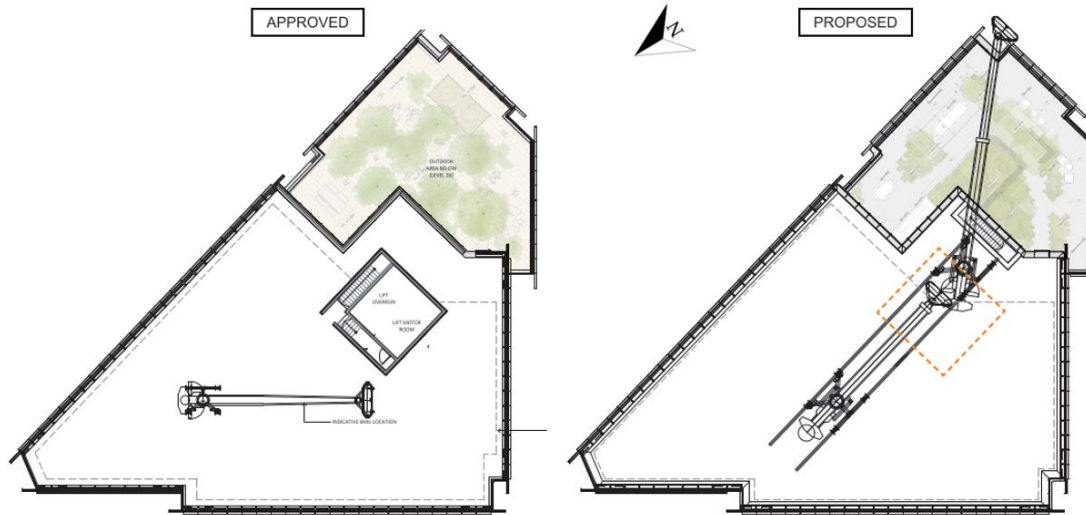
| Approved roofscape (left) and proposed (right) roofscape with removed lift motor room and relocation of building maintenance unit (Source: Applicant's Design Report and Architectural Plans)
